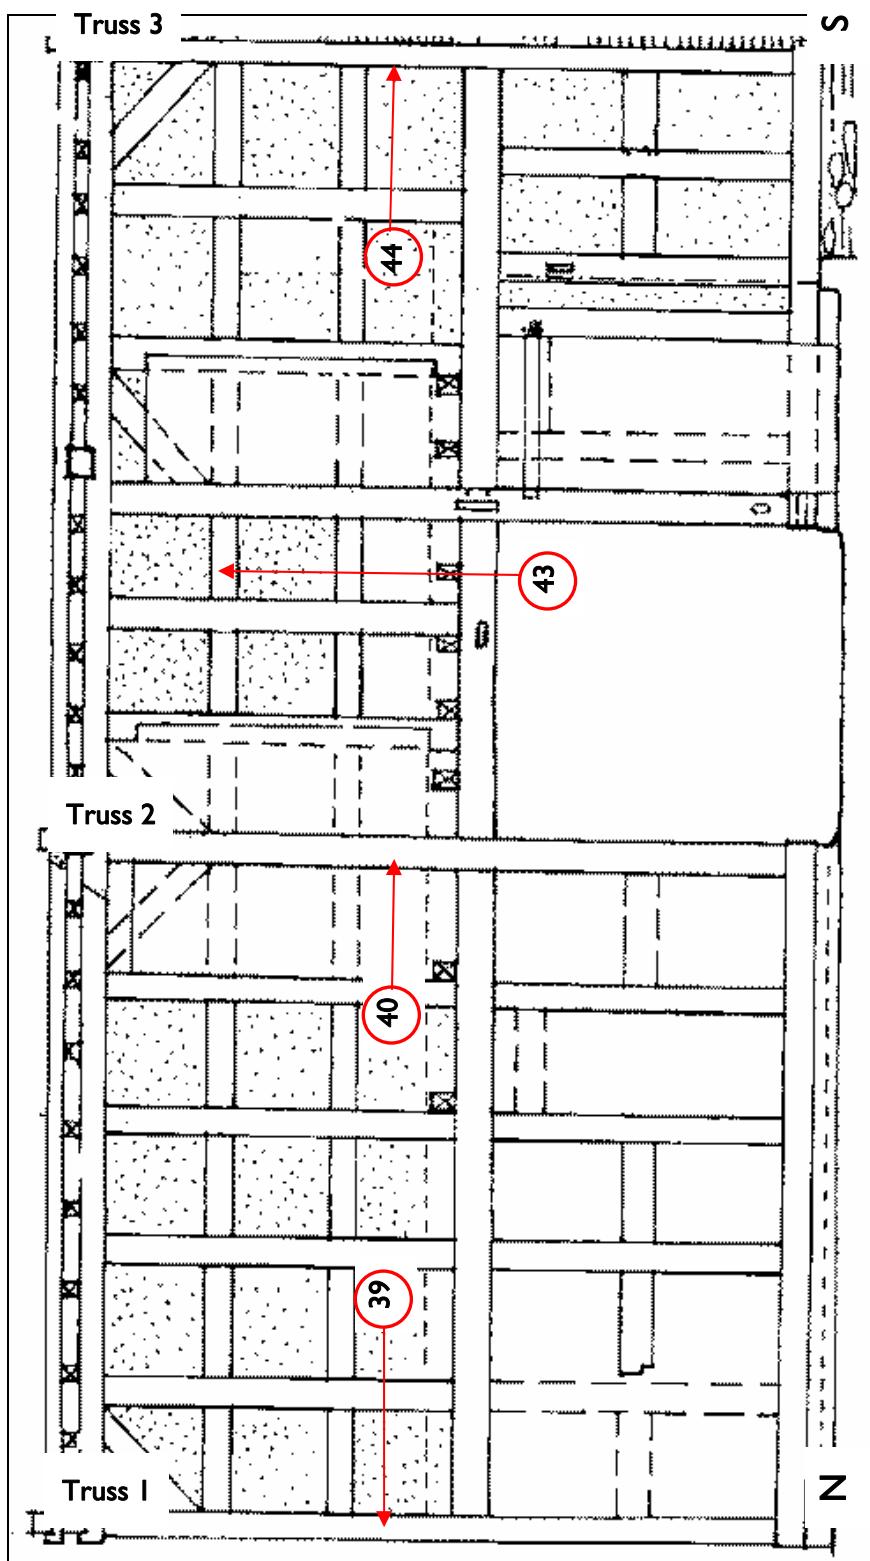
West elevation of the gatehouse to show timbers sampled (after Jones 1975–76)
